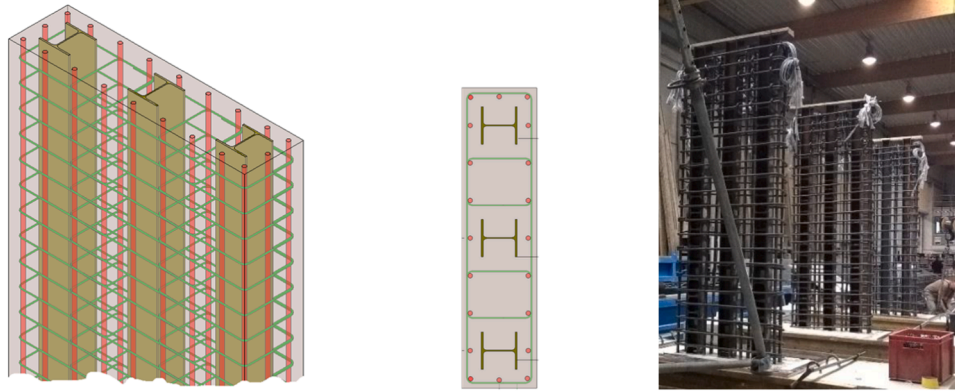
Examples of concrete walls reinforced with several encased steel profiles.
